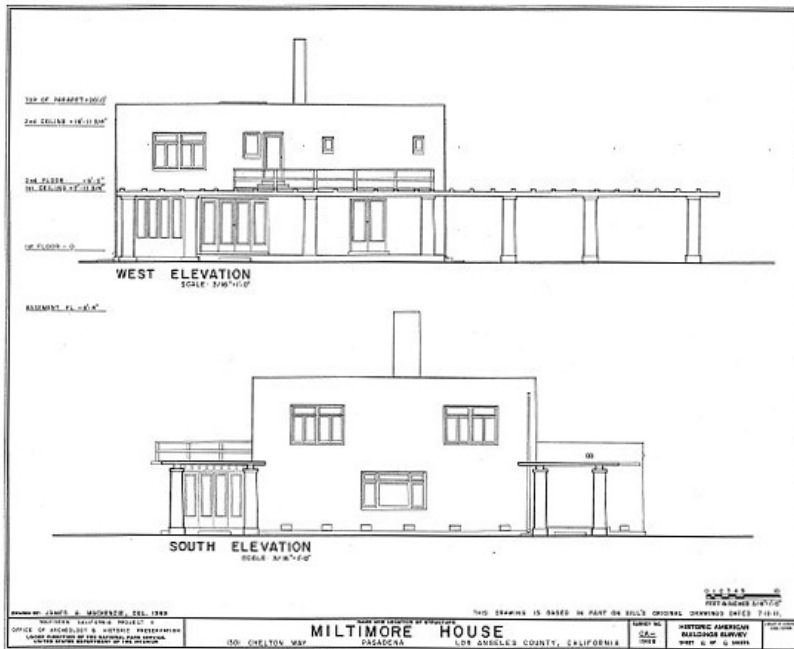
West and south elevations of the Miltimore House, 1911, Irving Gill. 1301 Chelton Way; South Pasadena Landmark #11. Source: Historic American Building Survey.
